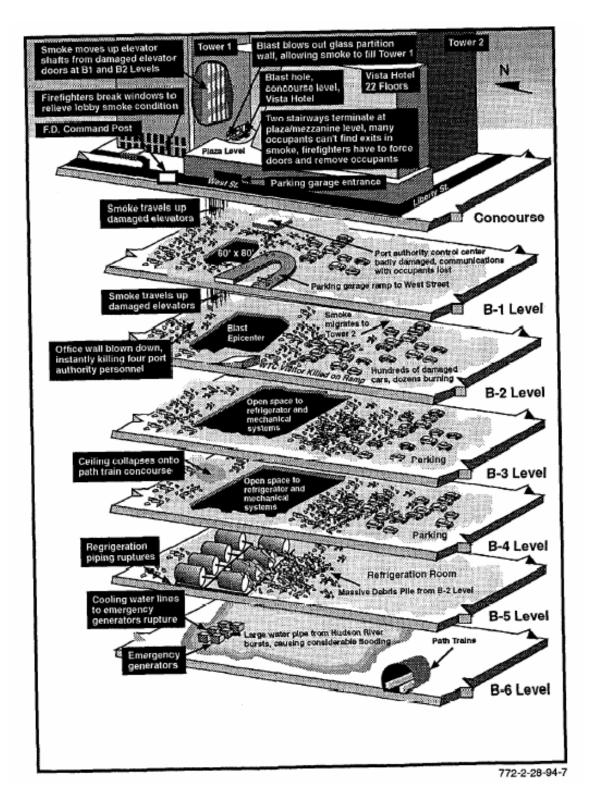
1993 World Trade Center Blast Damage. [16]
